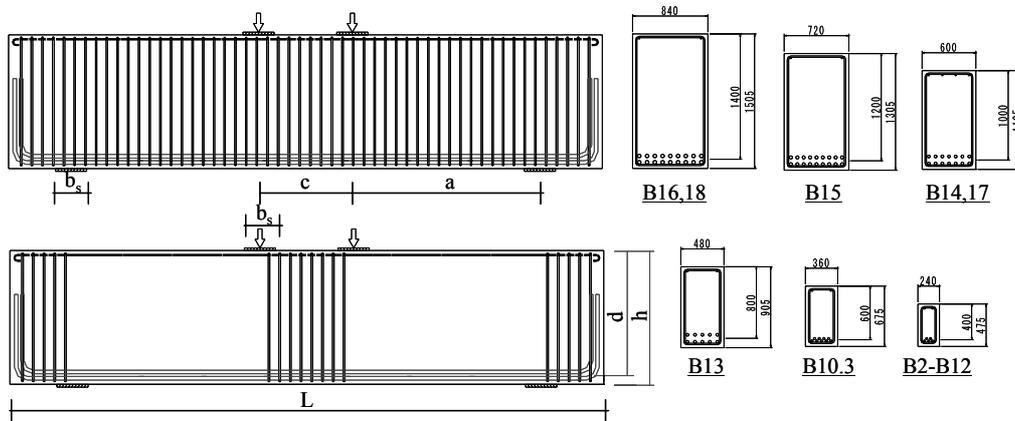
DETAIL OF SPECIMENS WITH AND WITHOUT STIRRUPS (UNIT: MM)
